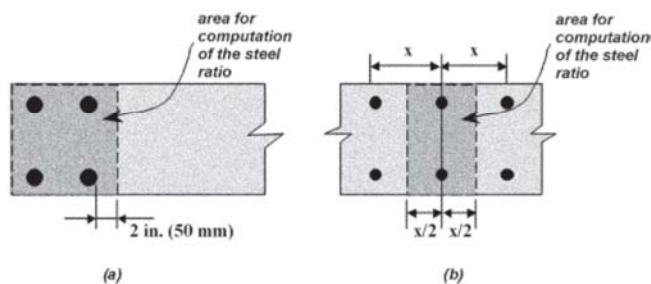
Calculation of vertical reinforcement ratio.
